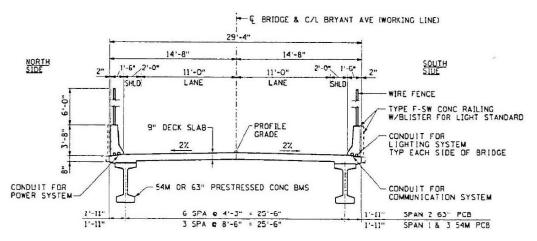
Existing Bridge No. 19544 Transverse Section
